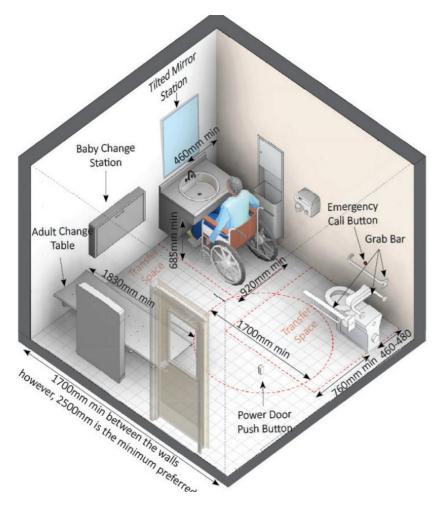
Building dimensions and standards for accessible bathrooms (Retrieved from Nova Scotia Interim Design Guidelines for Public Buildings)
